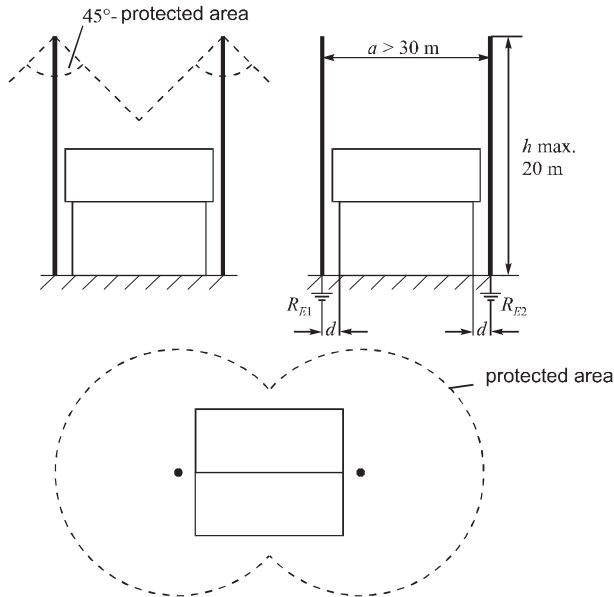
Air terminal – lightning rod with protected area greater than 30 m [79]
